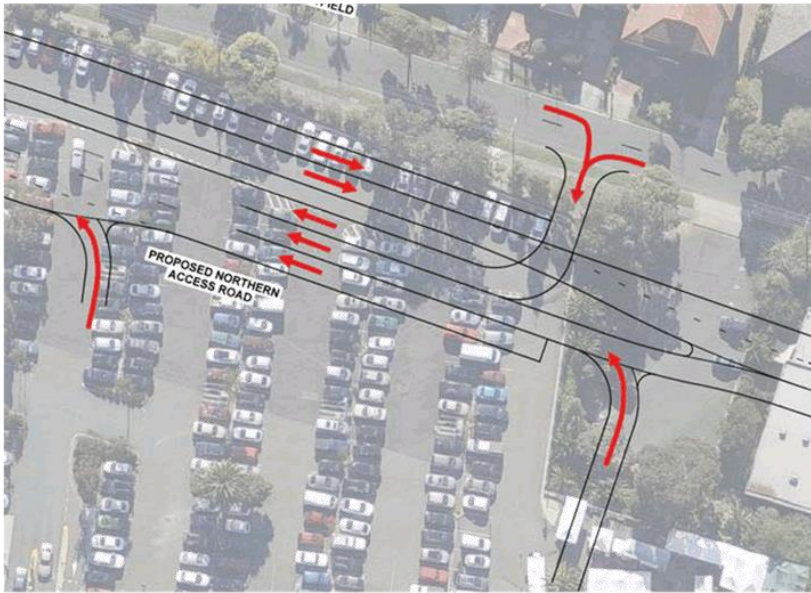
Configuration of proposed Westfield Drive Access and Proposed Northern Access Road
